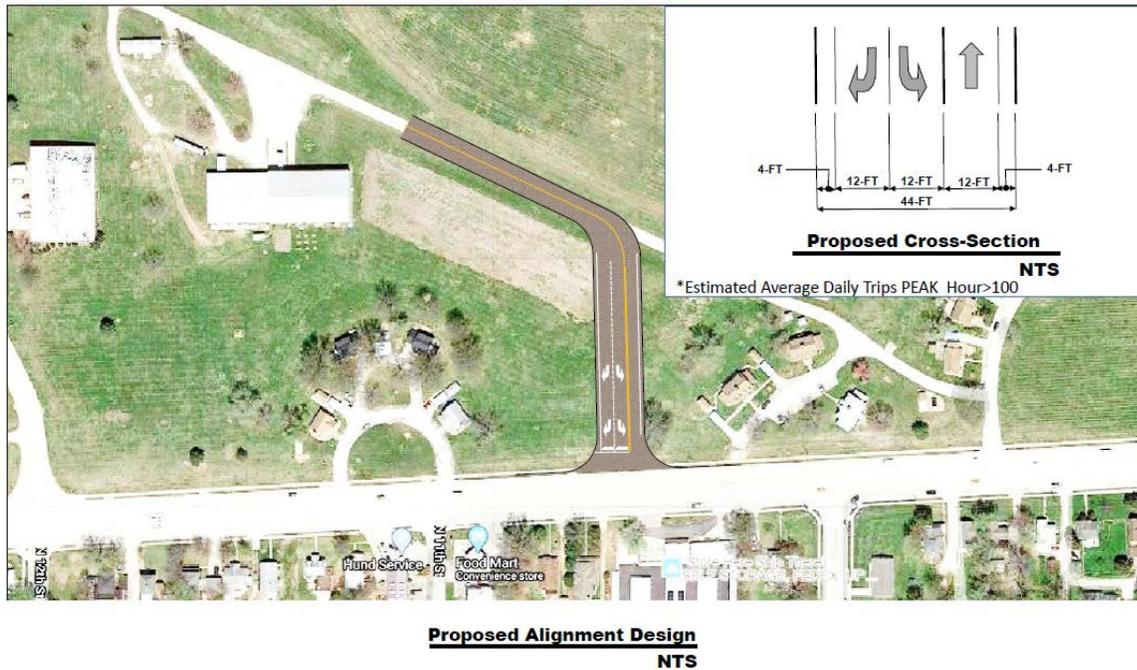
Proposed Entrance at Metropolitan Avenue
